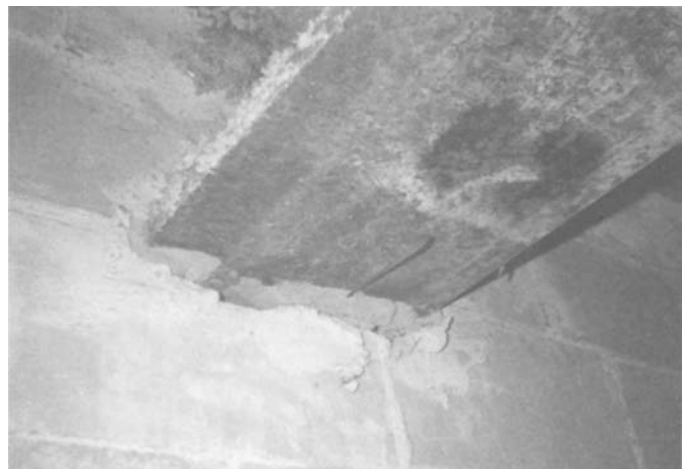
Unremoved fireproofing between flange and masonry blocks.
